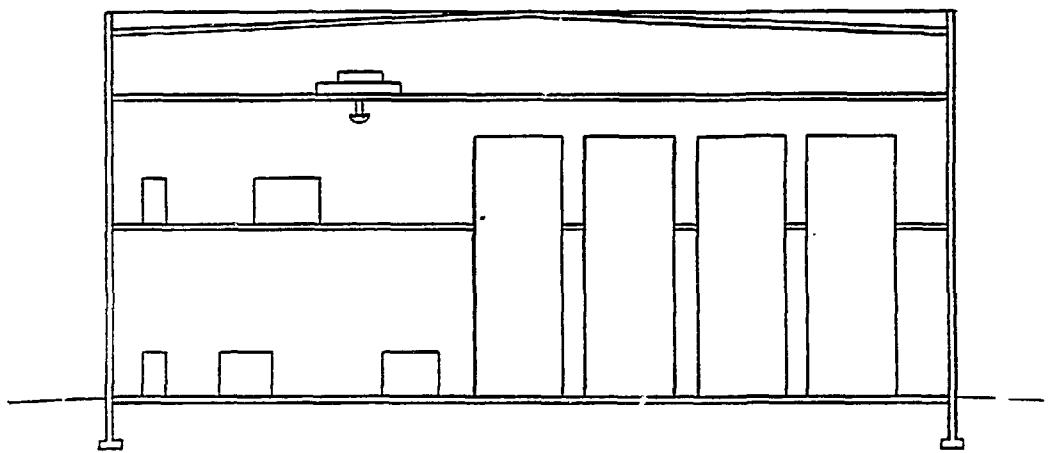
Elevation Cross Section of the Tritium Reprocessing and Cryogenic Building
